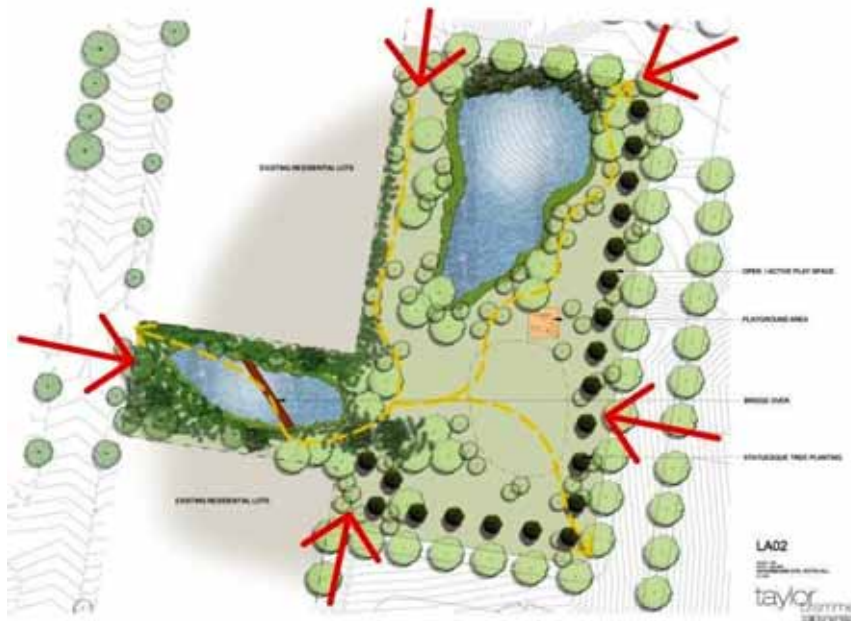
Preliminary concept for proposed 'Cooper Road Park'
